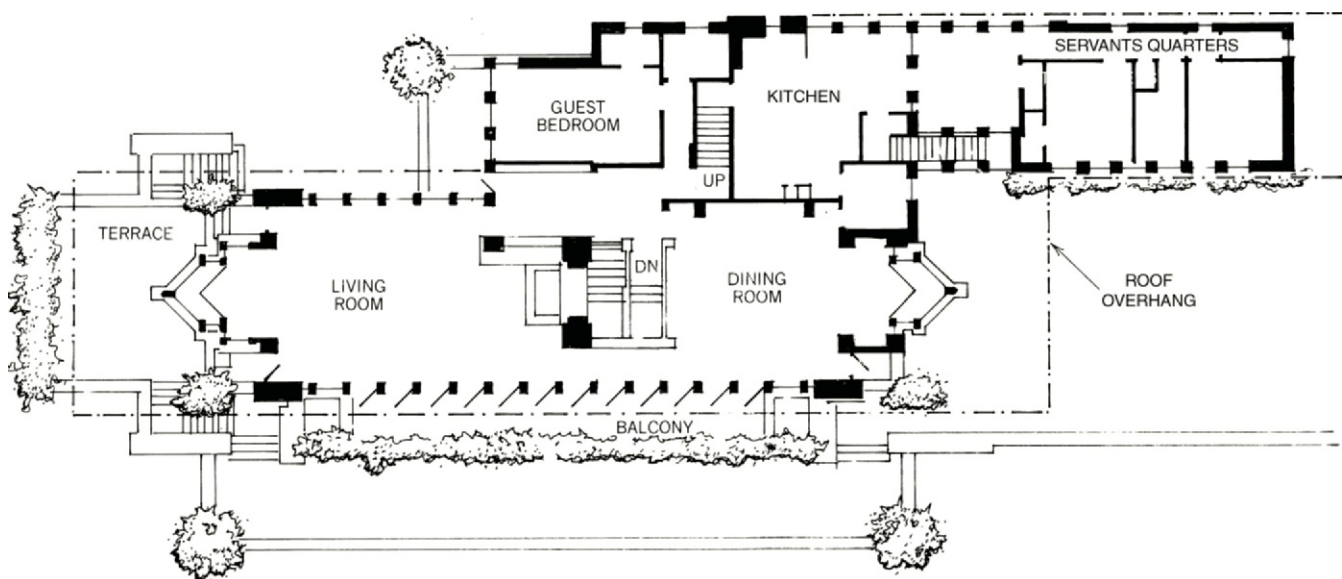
Frank Lloyd Wright's Robie House (1909) in Chicago has whole walls of doors and windows that open for cross ventilation. It also has large roof overhangs to keep out the sun and rain.
